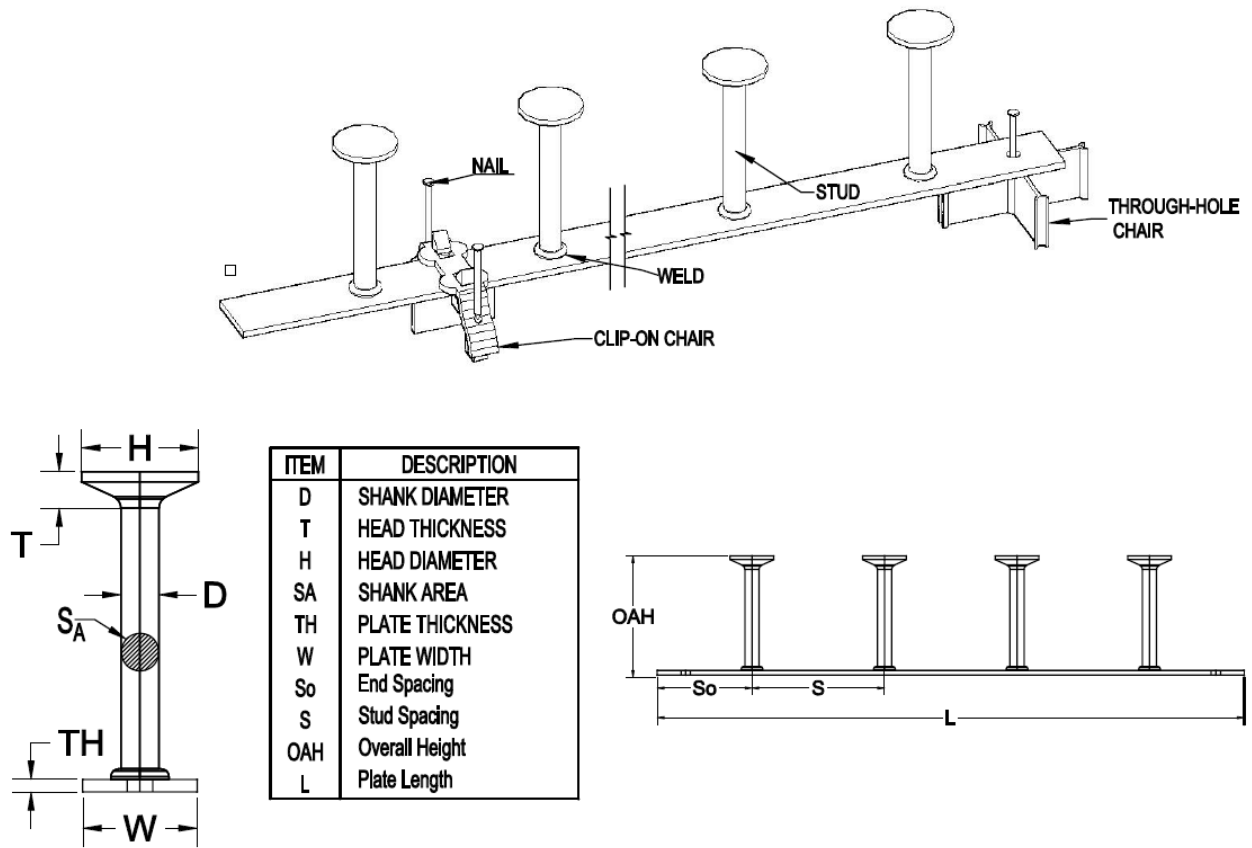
TYPICAL PJ'S PSR STUD RAIL REINFORCEMENT SYSTEM ASSEMBLY
